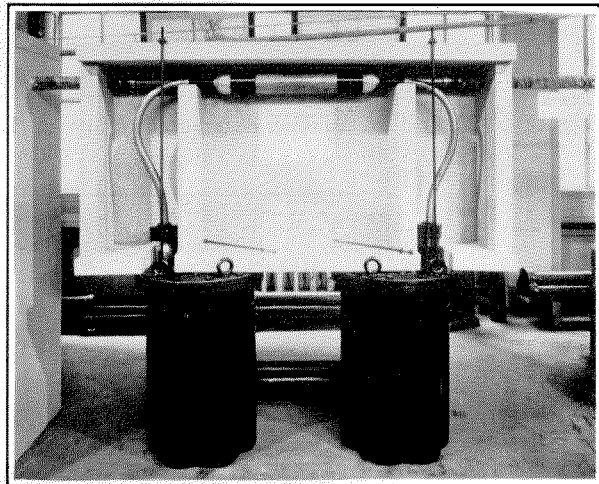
Concrete Box Manhole, illustrating method of burying pots while the joint is protected by a concrete box
